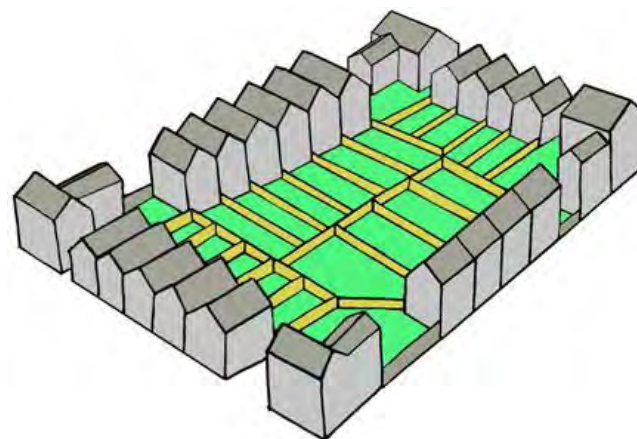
The site layout should clearly define public spaces and secure private spaces. The perimeter block approach provides a clear distinction between public and private spaces.
